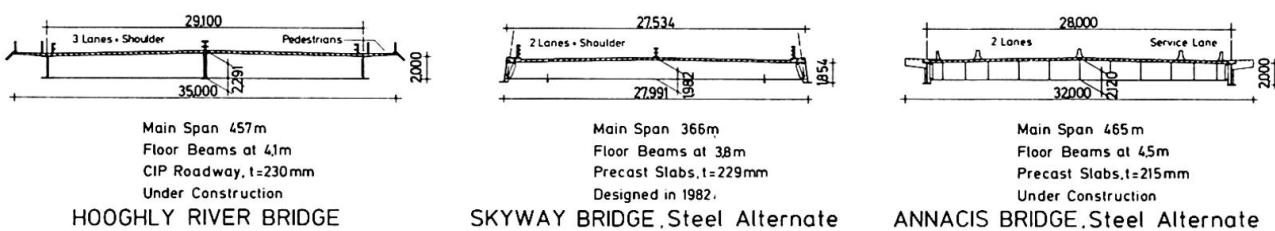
Cross-sections of long-span cable-stayed composite bridge beams
